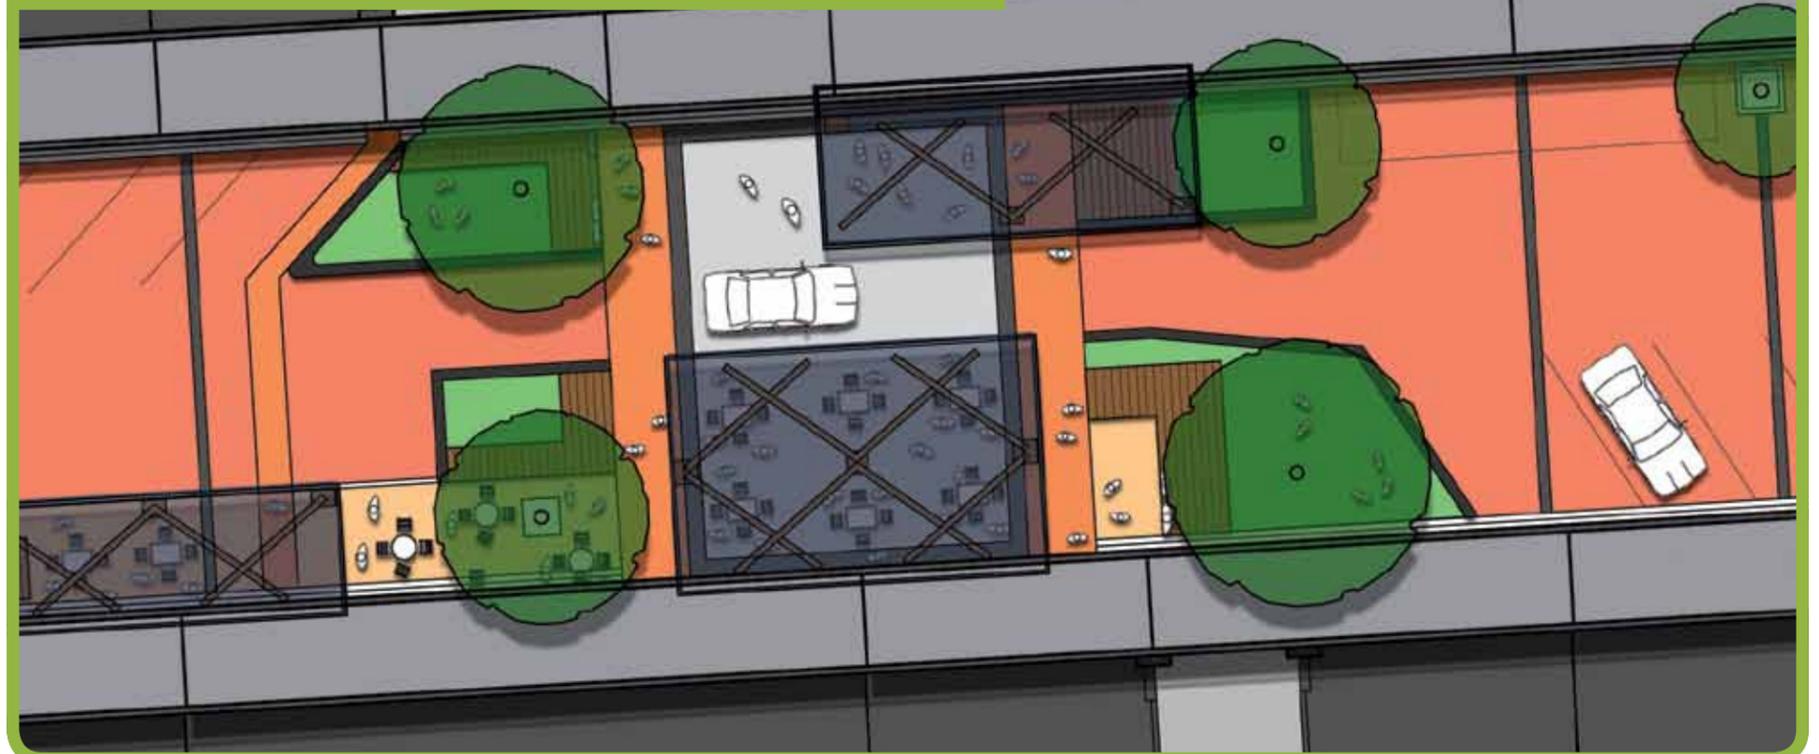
Cross-section of proposed Mid-Esk Street Pocket Park
